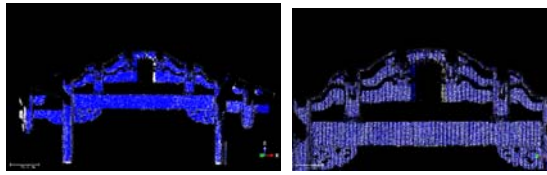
Front beam and column joints of the shed of the point cloud overlay
